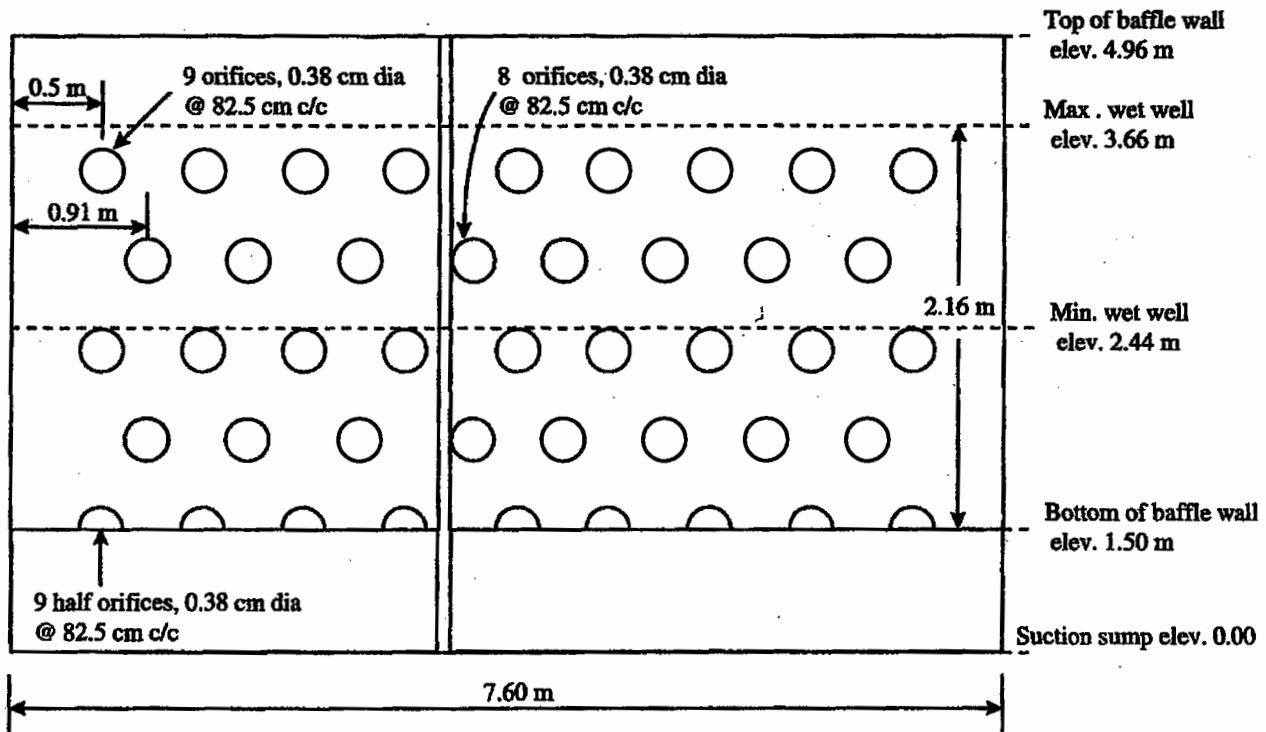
Orifice Arrangement in the Baffle Wall.
